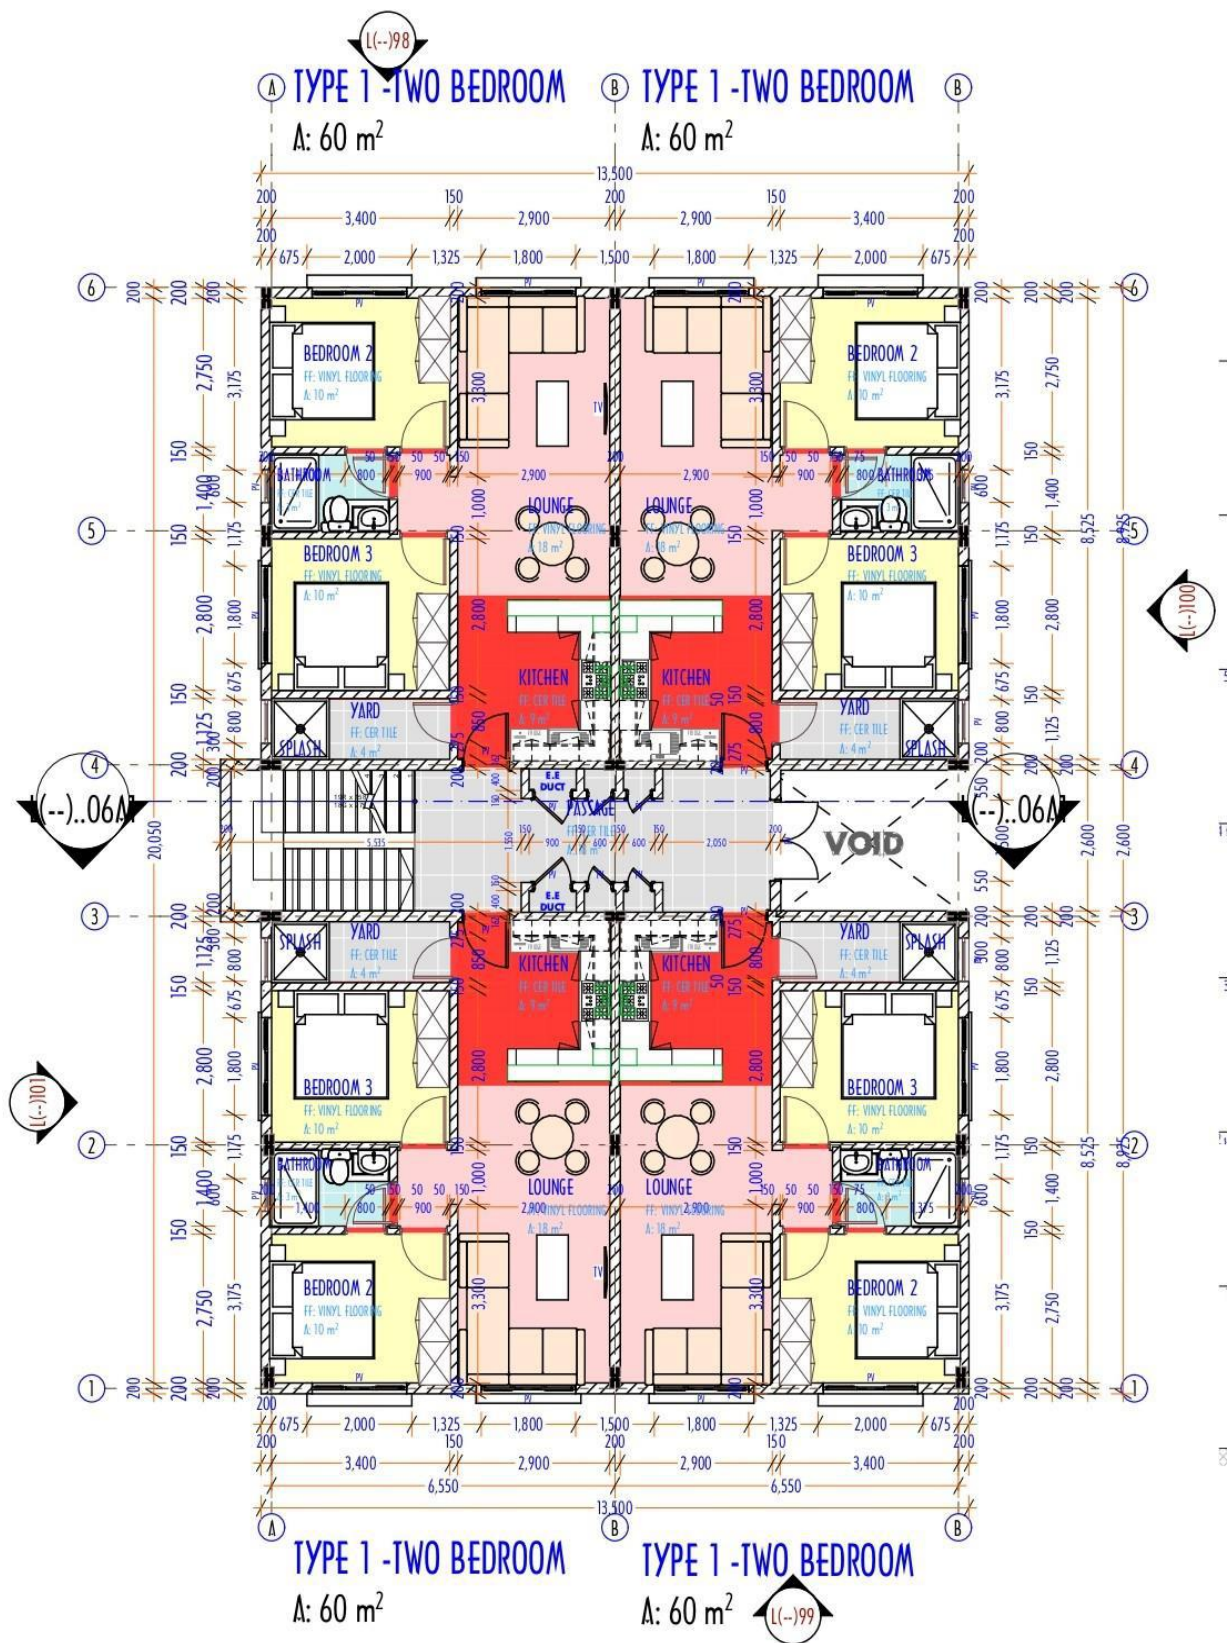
Floor Plan Layout for a 2 Bedroom Housing Unit
